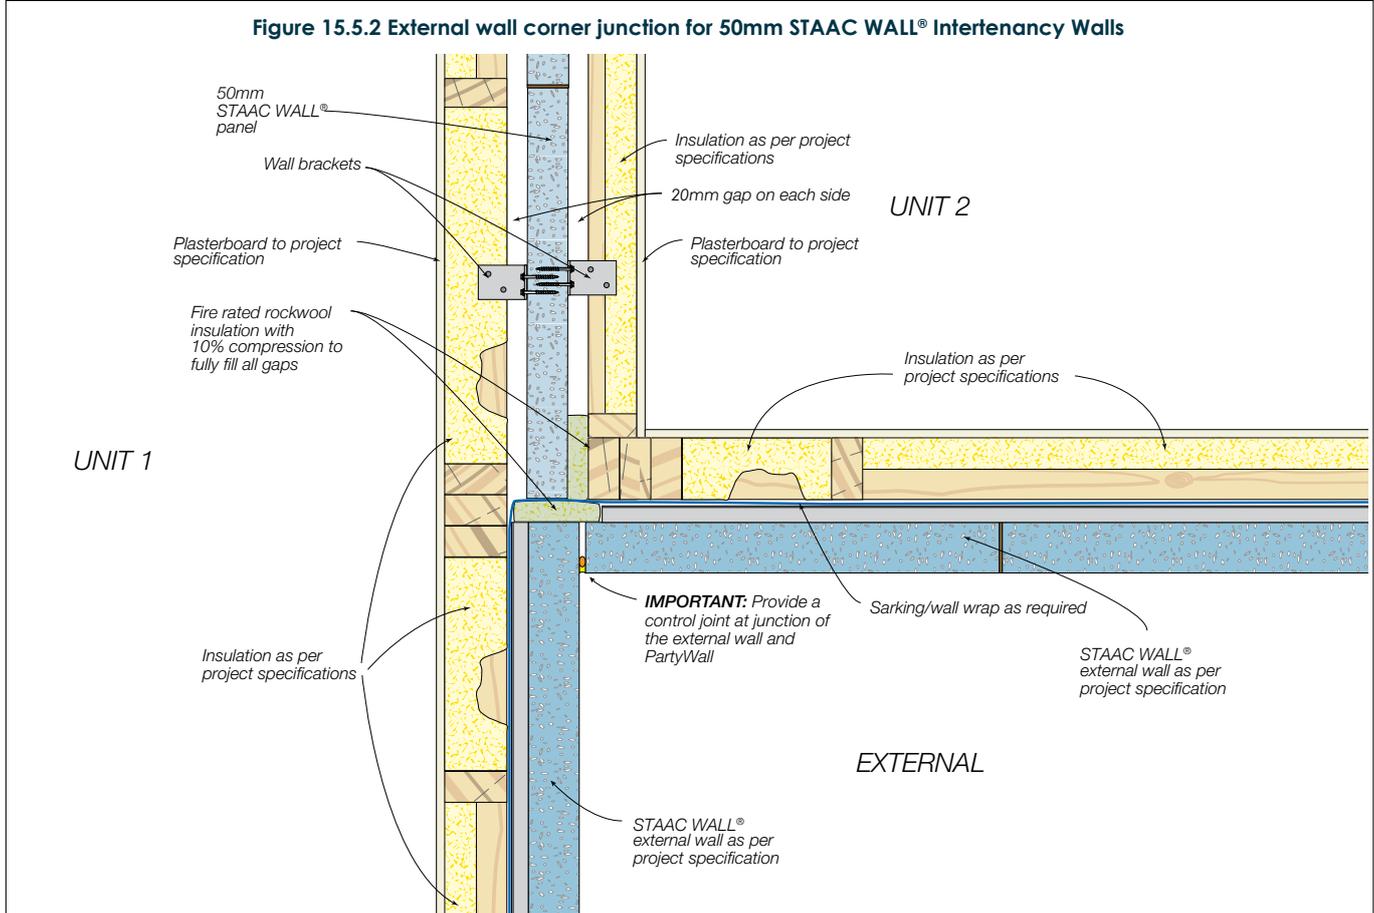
External wall corner junction for 50mm STAAC WALL® Intertency Walls
